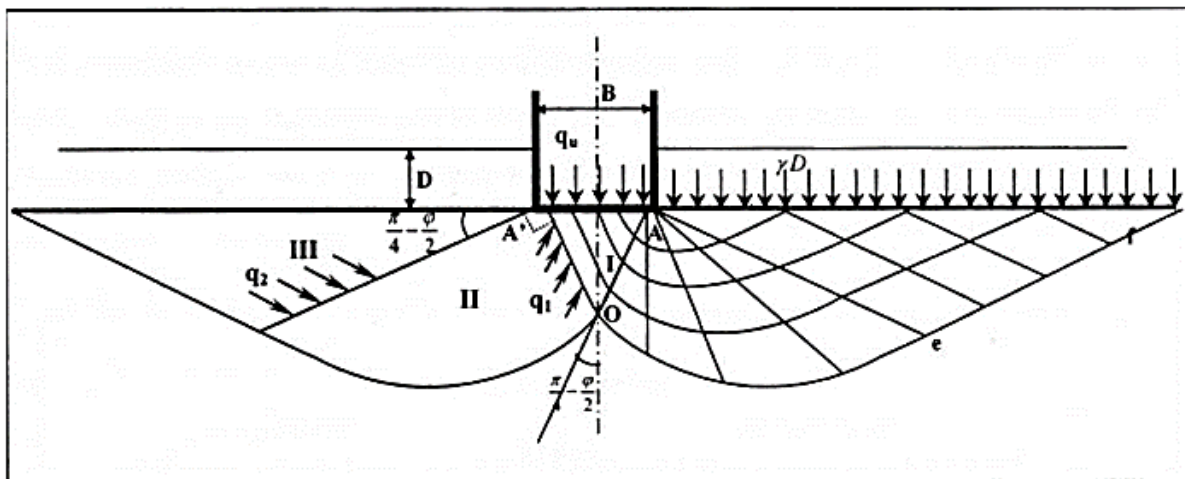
Failure mechanism of a foundation with a smooth base (Prandtl, 1921).
